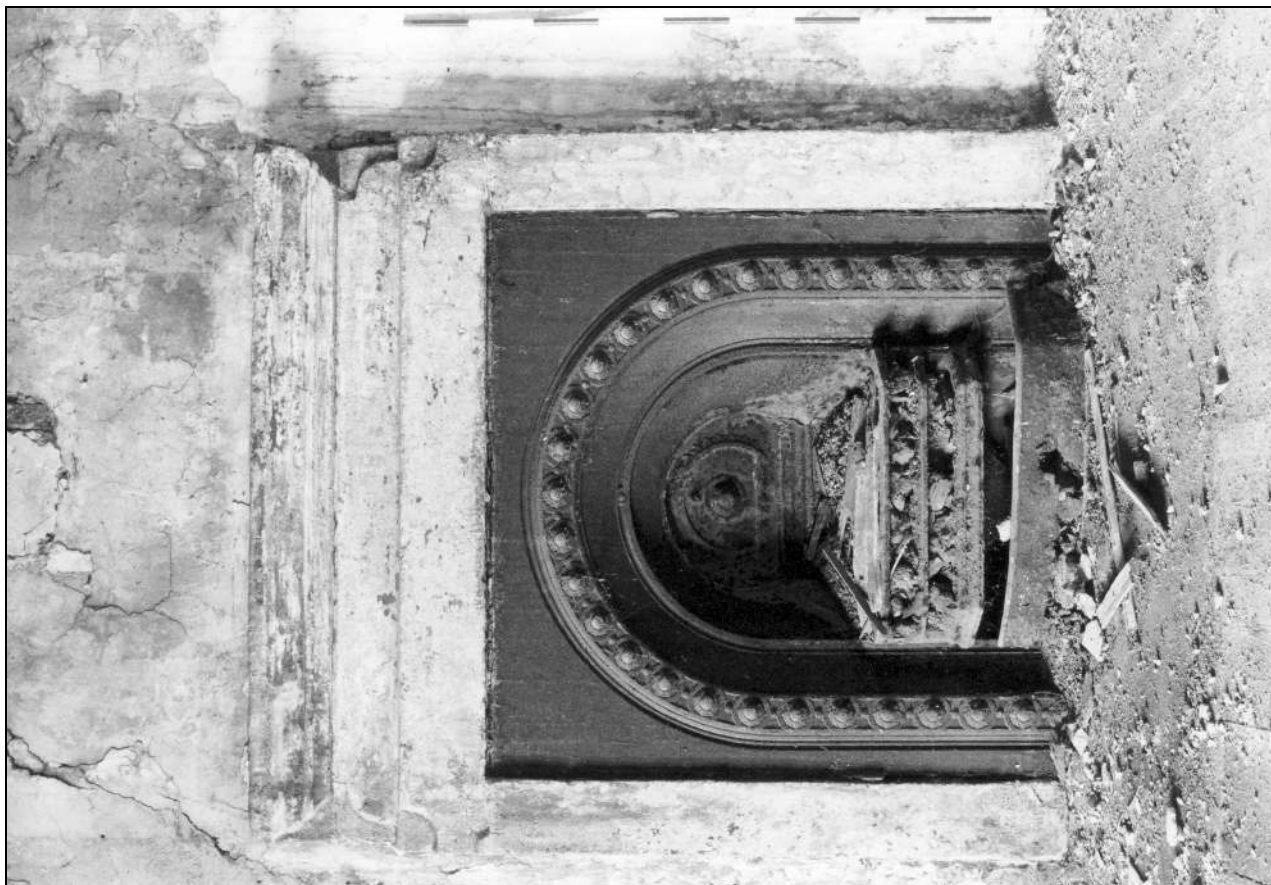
Detail of fireplace in east chamber (film 2, frame 16)
